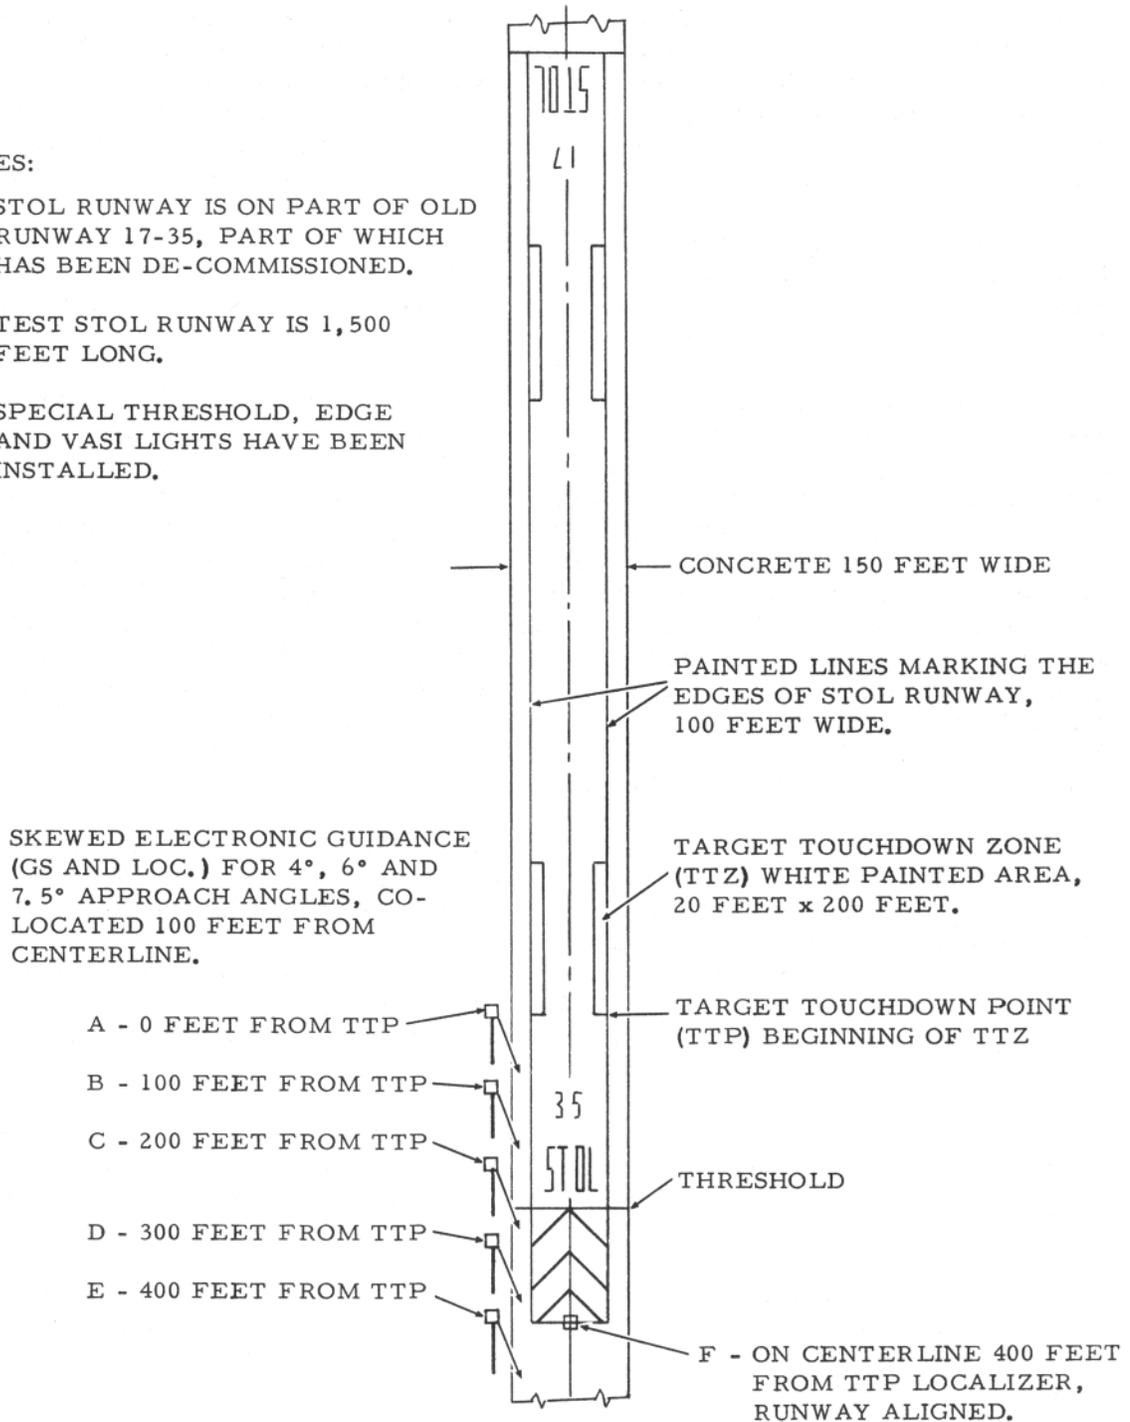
NAFEC STOL RUNWAY LAYOUT DETAILS
